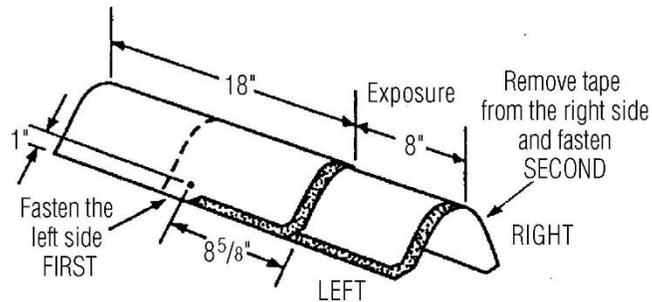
Installation of Shangle® Ridge shingles on hips and ridges.
